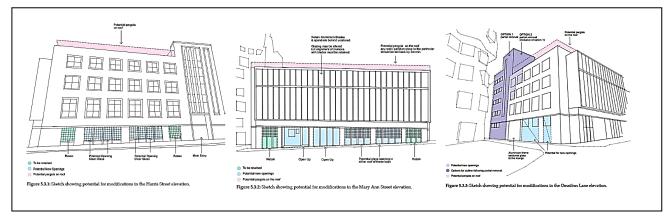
Conservation Management Plan Diagrams 5.3.1, 5.3.2 and 5.3.3 (Design 5 Architects)
